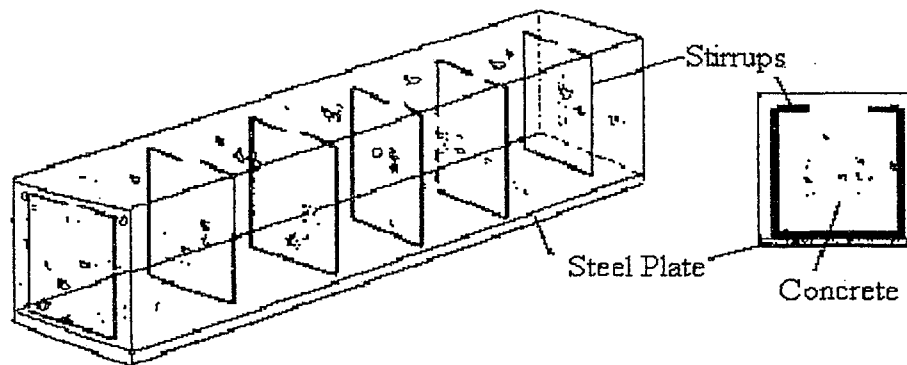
(a) Steel plate-stirrups assembly (Hossain 1999)
